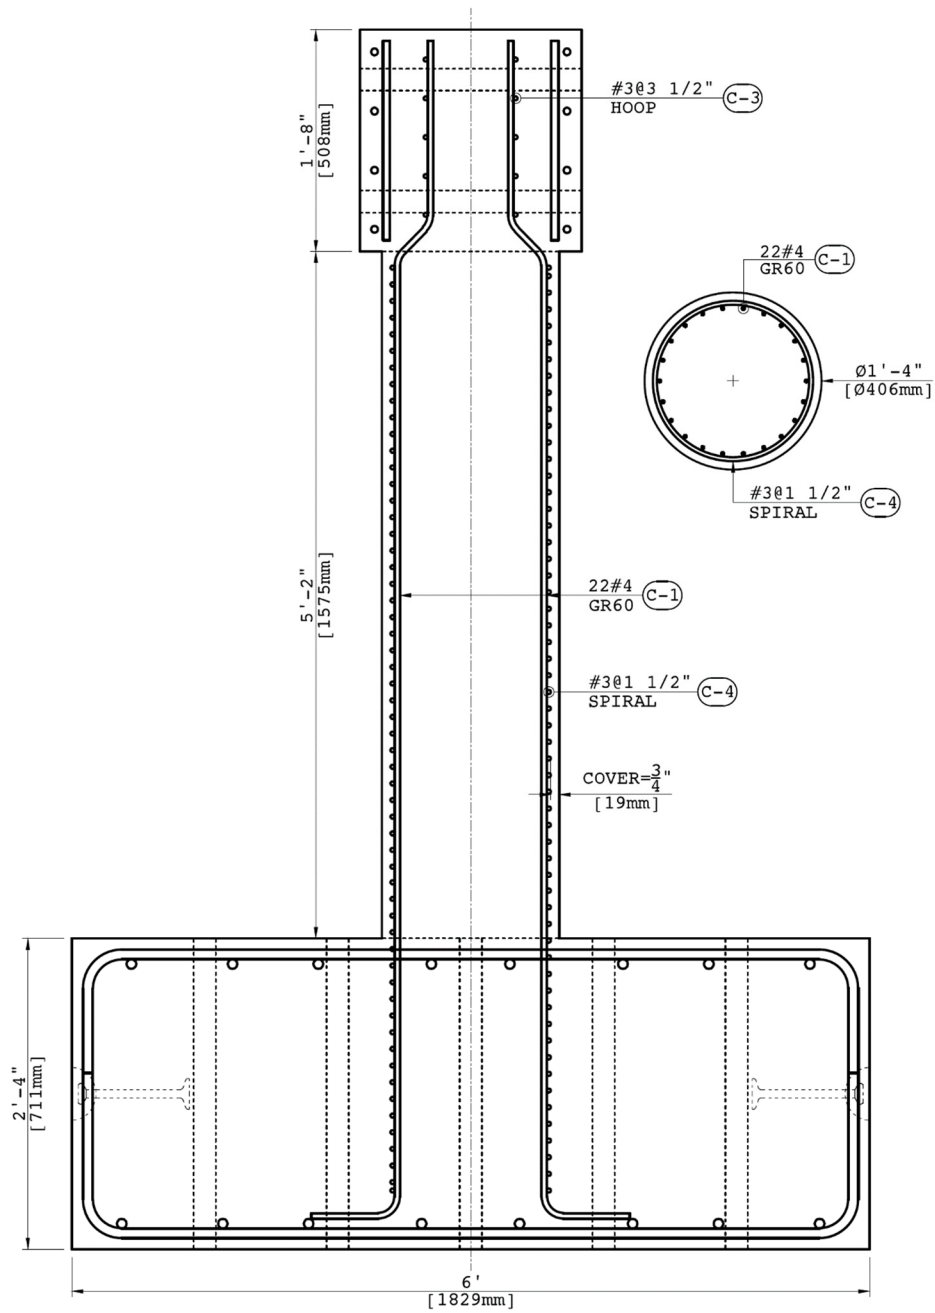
Column LD-S1.5-G60: reinforcement details.
